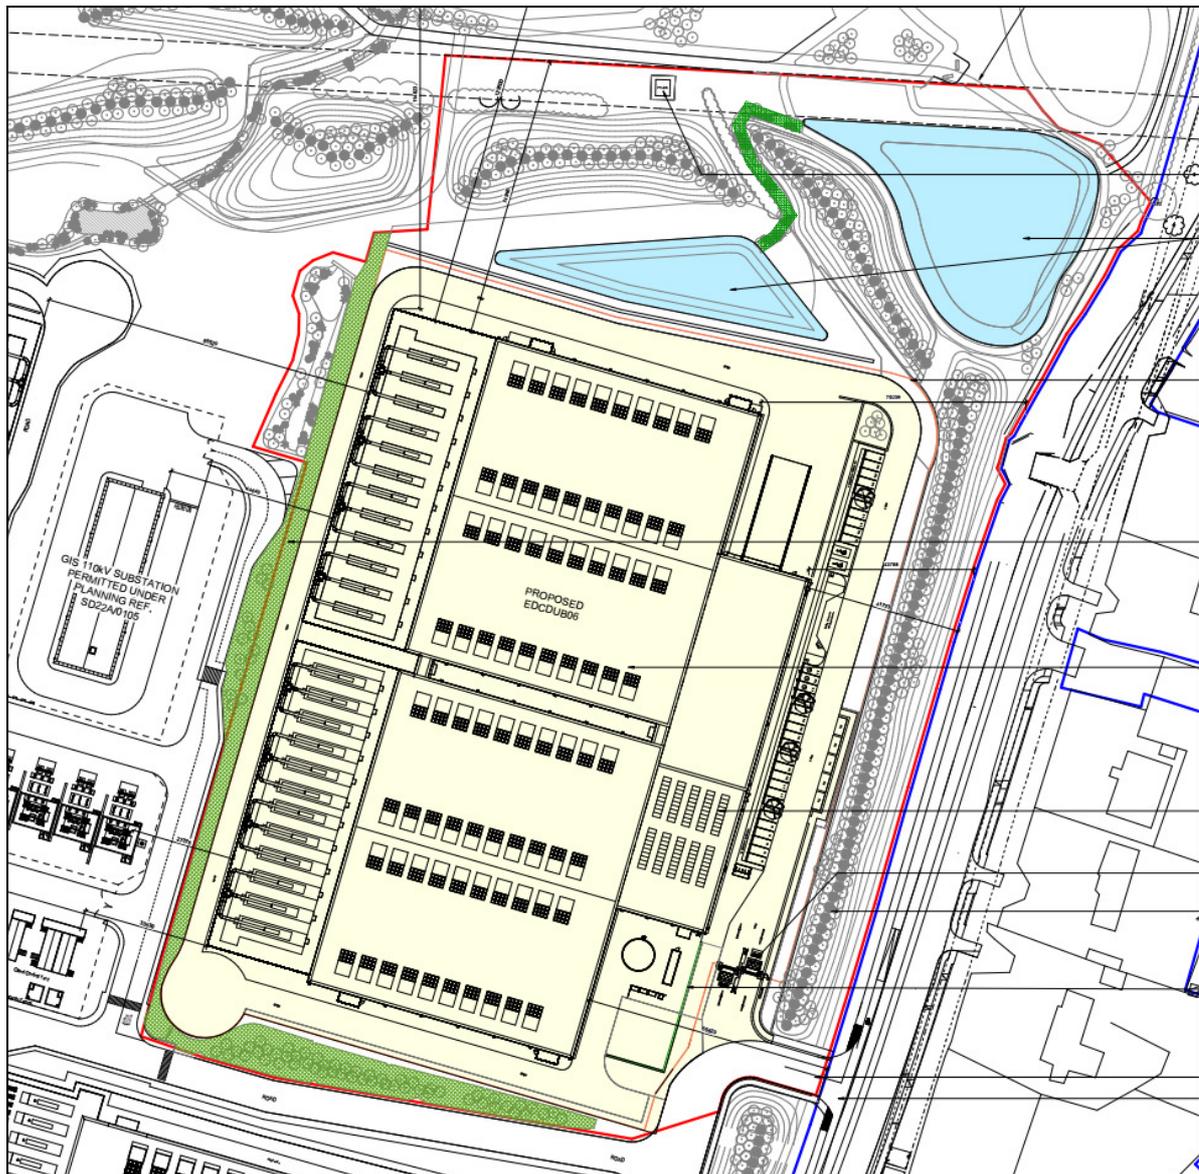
Plan showing alignment of new western and southern hedgerow (green), proposed new bio-swale to north (dark green)
